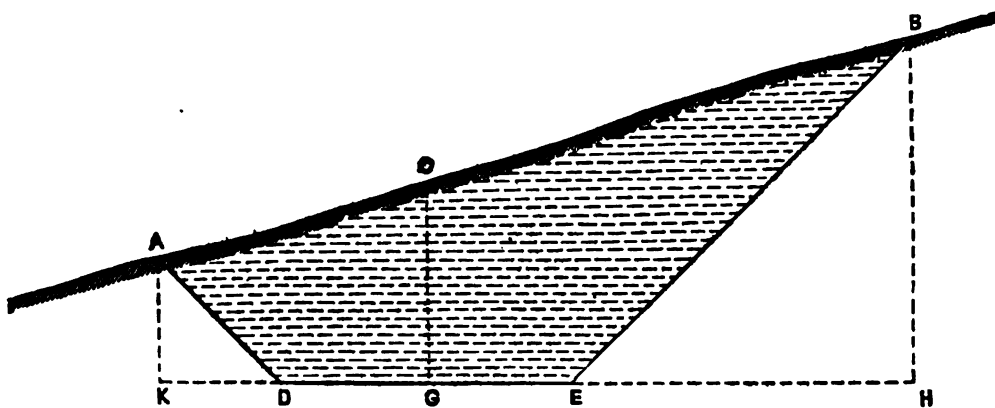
shows a cross section of a cutting where the ground surface has a sidelong slope, and may or may not have a slope in the direction of the road.
